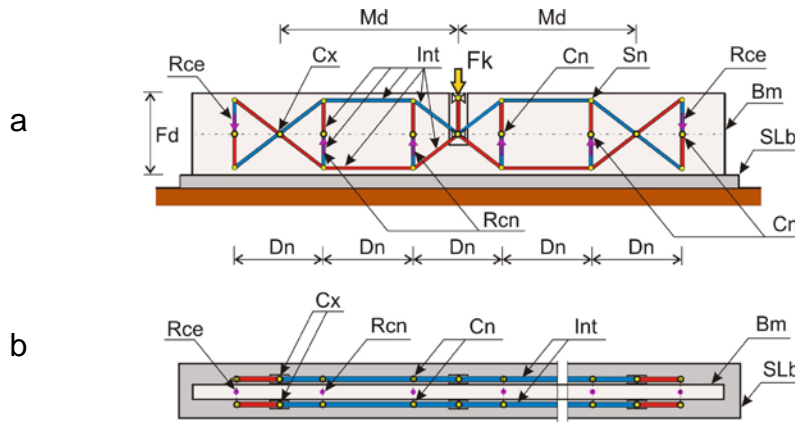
Recommended geometry of components inside space of proposed structural system of foundation
